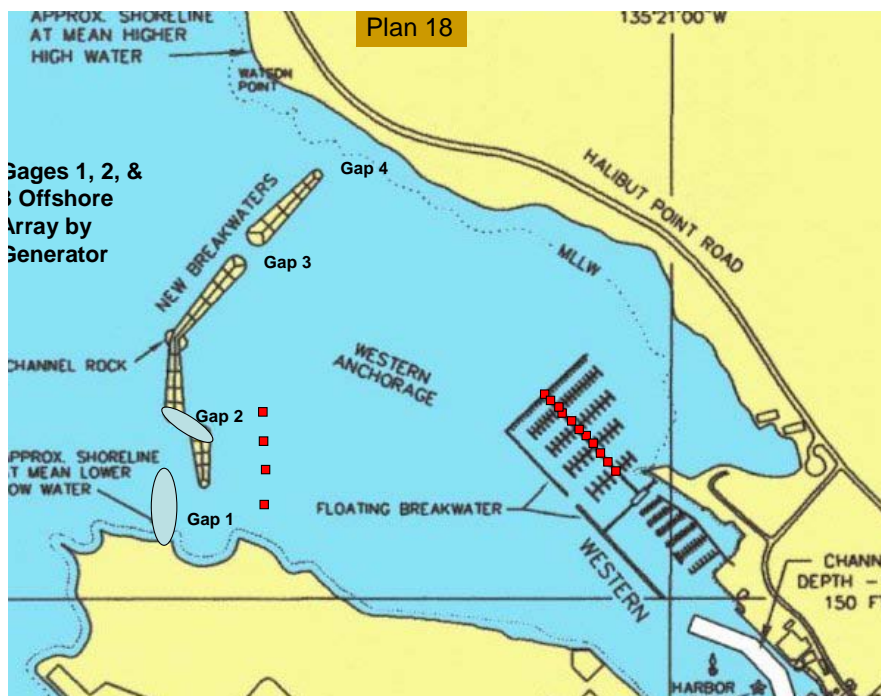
Plan 18 is a combination of Plan 1 and Plan 4.
